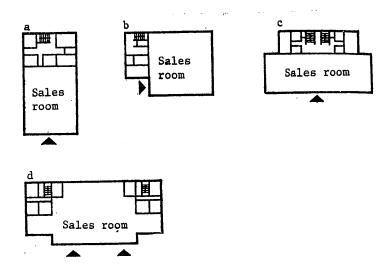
Space-floor plan layouts of store buildings. a--End; b--in depth; c--frontal; d--combined.
